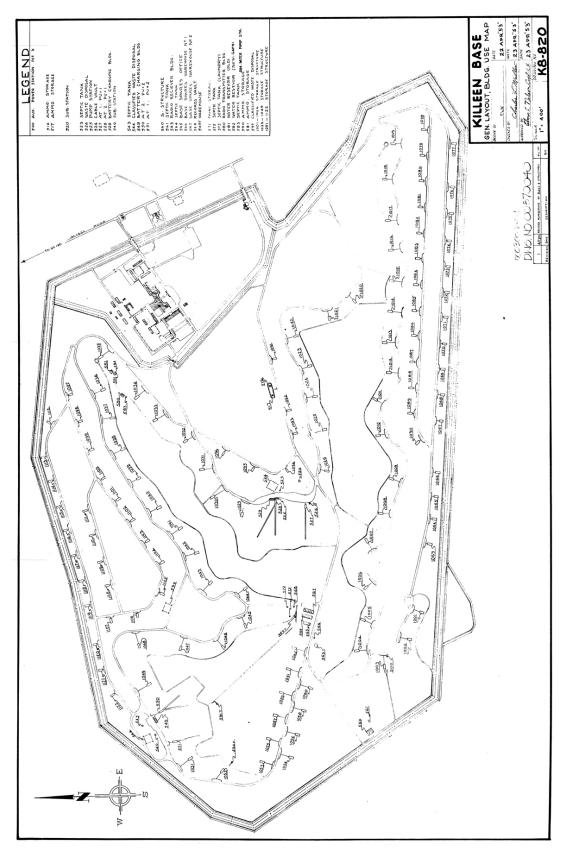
Killeen Base General Layout and Building Use Map, dated 23 April 1953 (Fort Hood).
